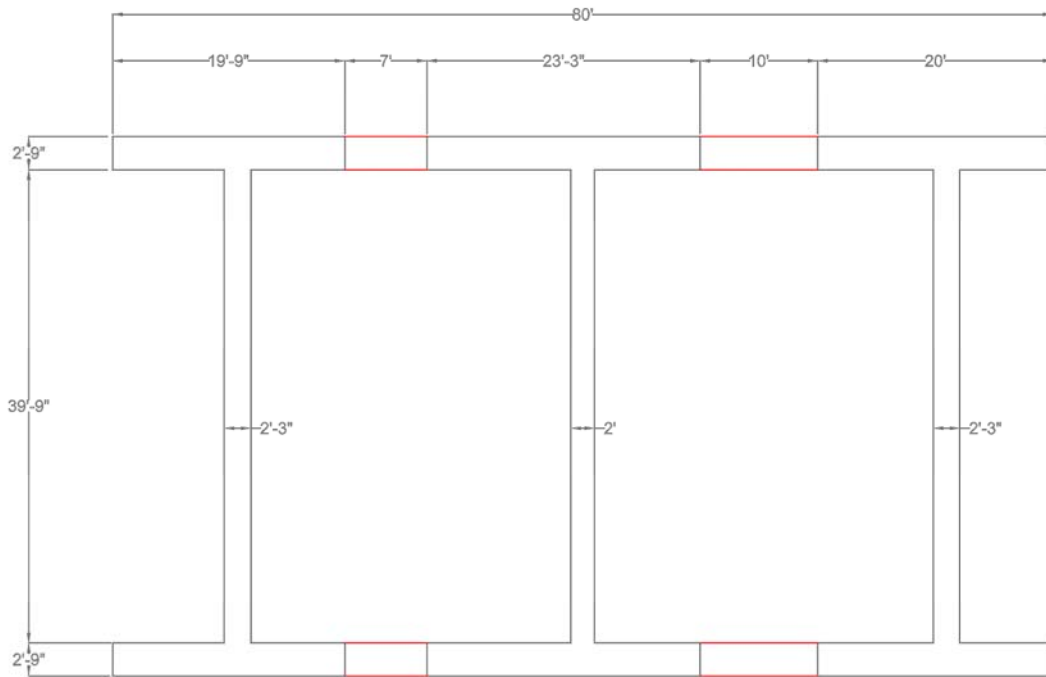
Final Design Core Plan: Level 10 – Level 43
